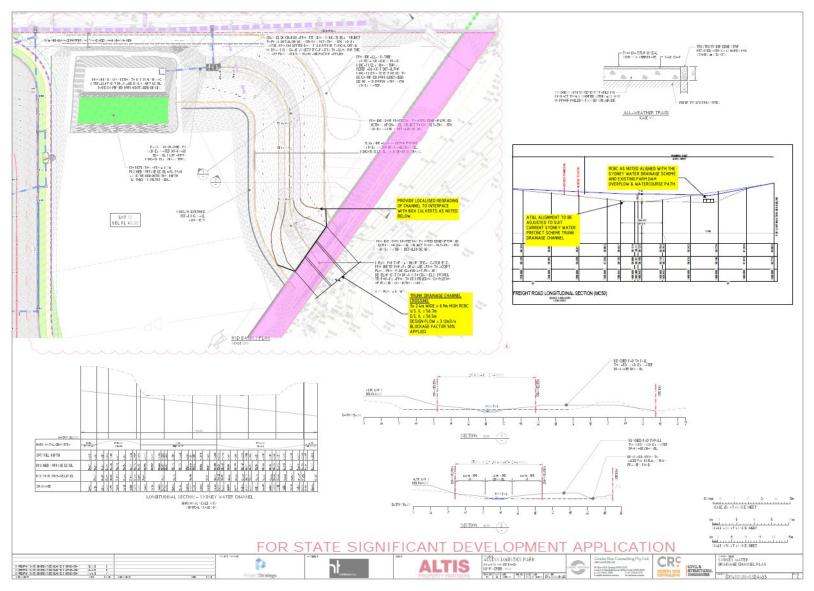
Sydney Water Trunk Drainage Corridor Plan
